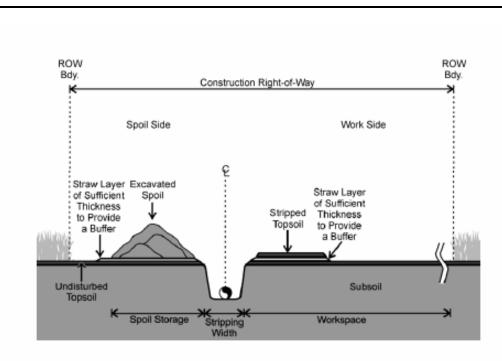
A-3 TOPSOIL SALVAGE – FULL RIGHT-OF-WAY
